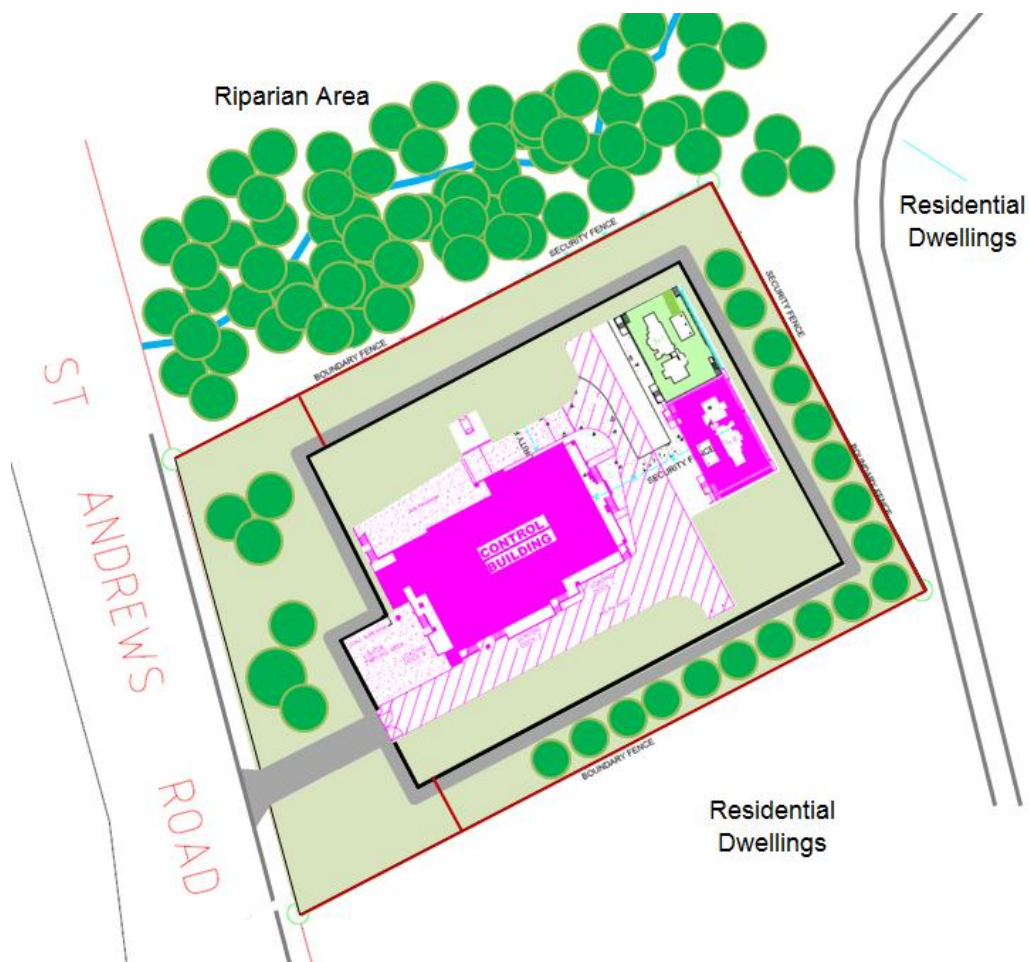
Preliminary Substation Layout of South Leppington Zone Substation
